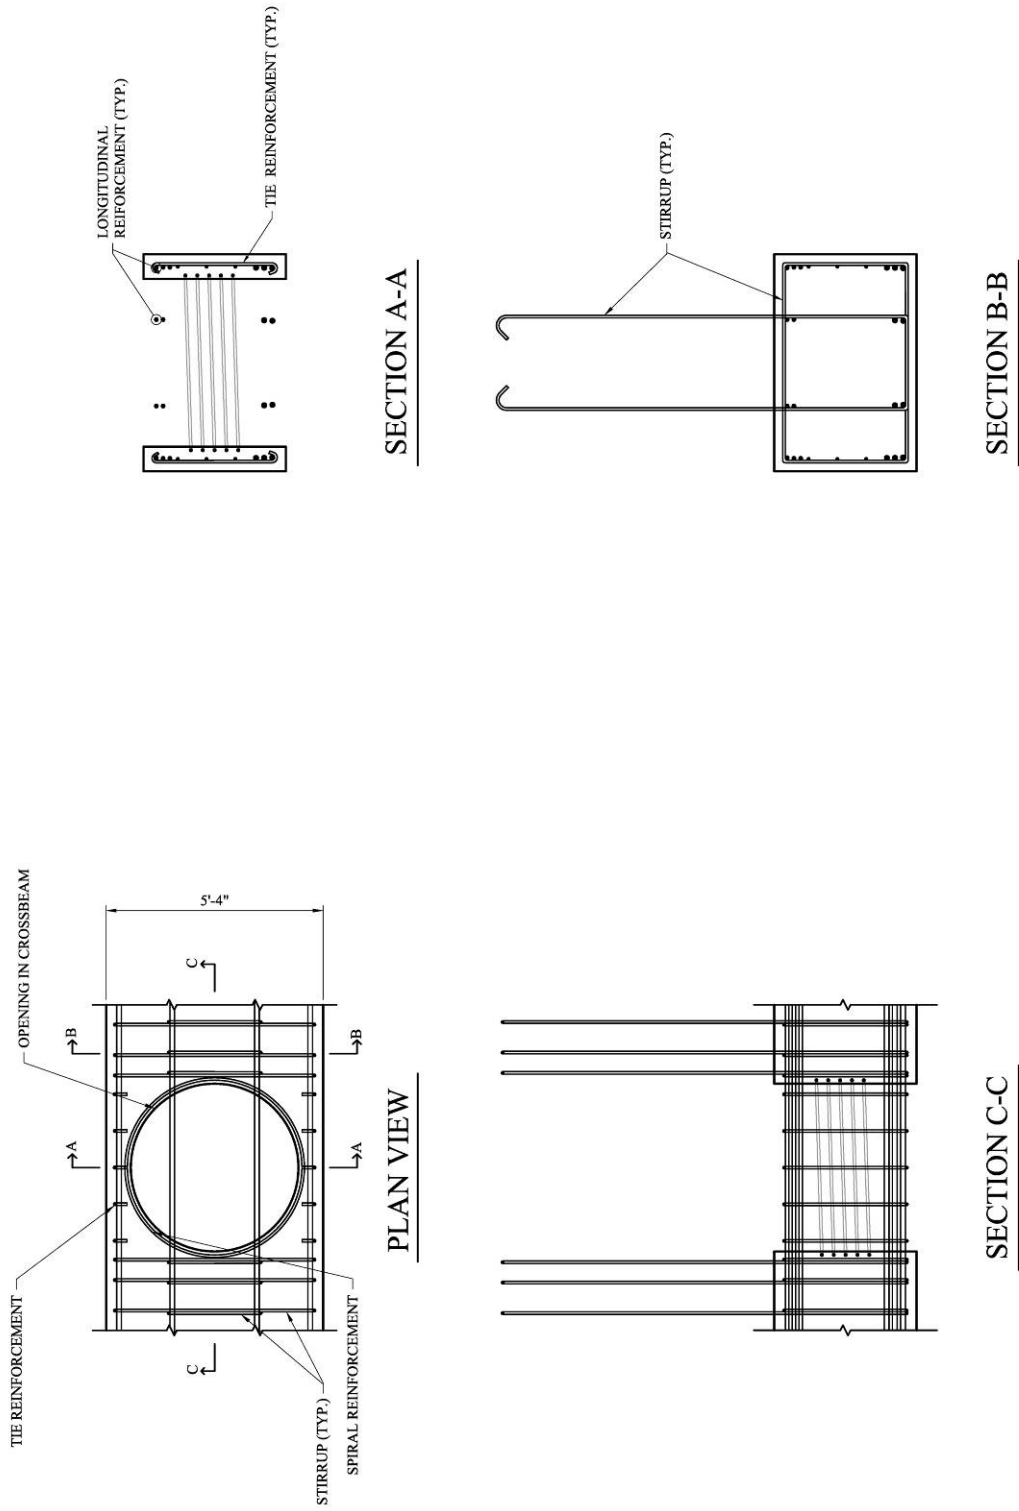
Cap-Beam Details for Complete Opening Connection for Reinforced Concrete Frames
